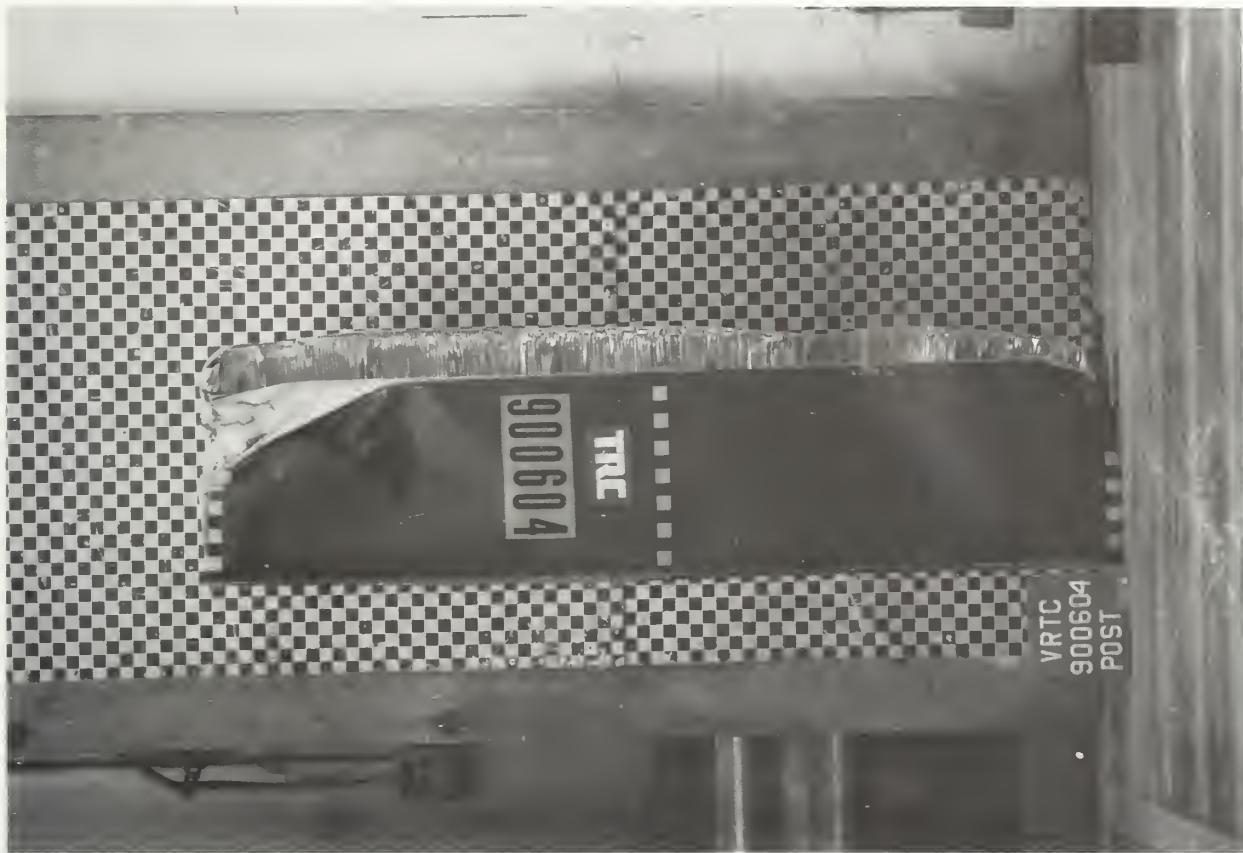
POST-TEST BARRIER FACE - VIEW 2
